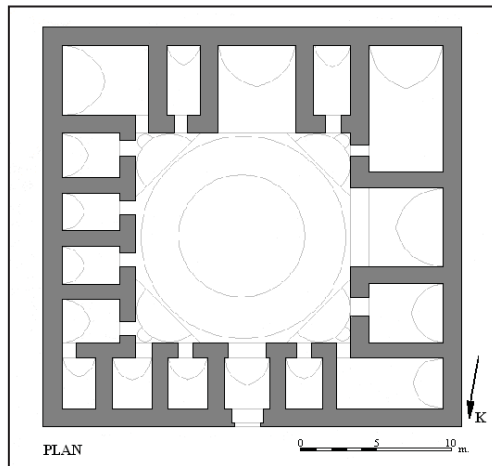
The plan of Çukur Madrasa, (Akin, 2009)
